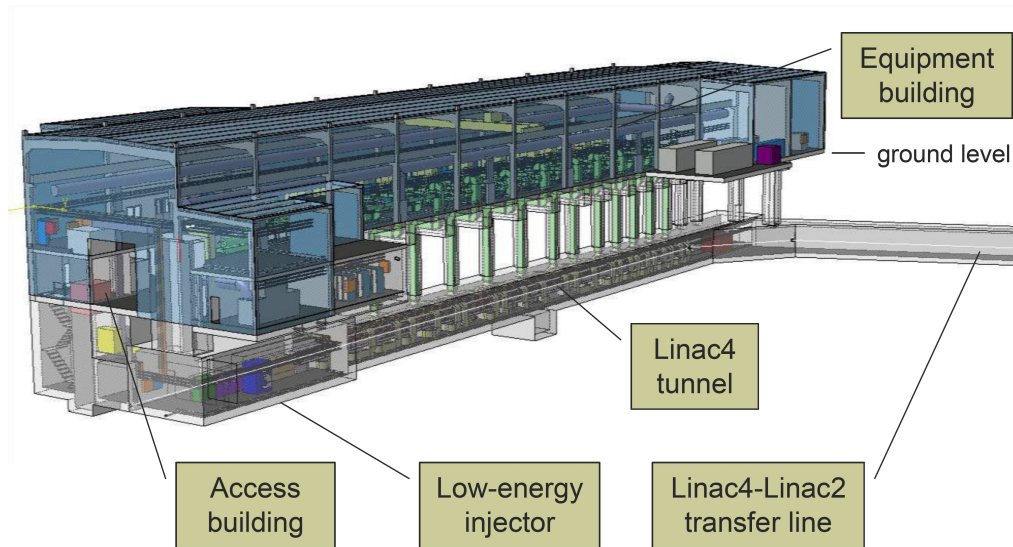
A layout of Linac4 building. The klystrons and other equipment are installed on the ground floor and accelerating structure are installed in a tunnel 12 m underground.
